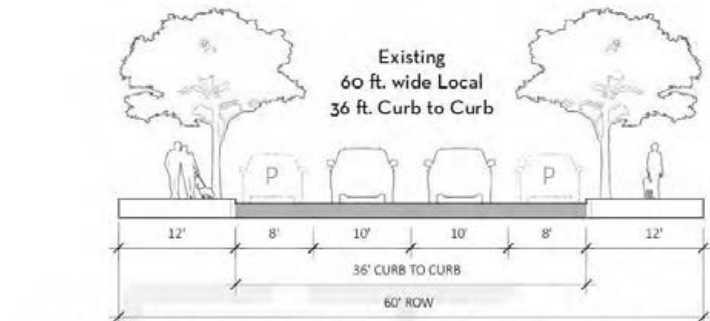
Typical 60 ft. wide ROW with 36 ft. wide curb to curb local street.
